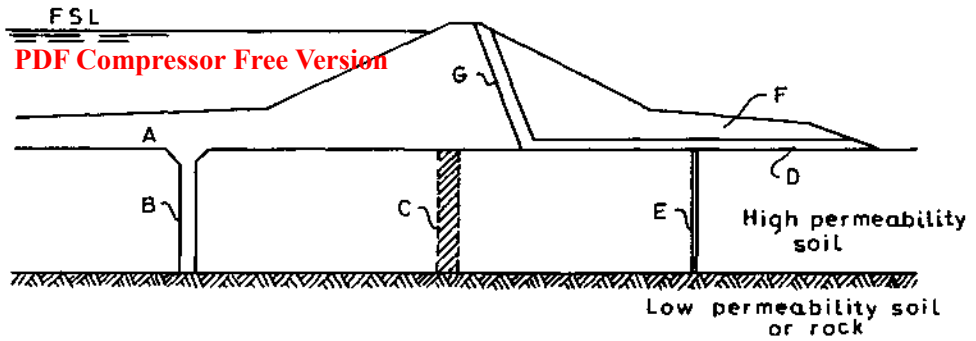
Design features for controlling seepage and erosion beneath earth dams on highly permeable foundations 1) Seepage-reducing methods: A, upstream impervious blanket; B, slurry trench; C, grouted zone. 2) Drainage methods: D, horizontal drain; E, relief wells; 3) Stabilizing methods: F, weighting berm; G, chimney drain.
